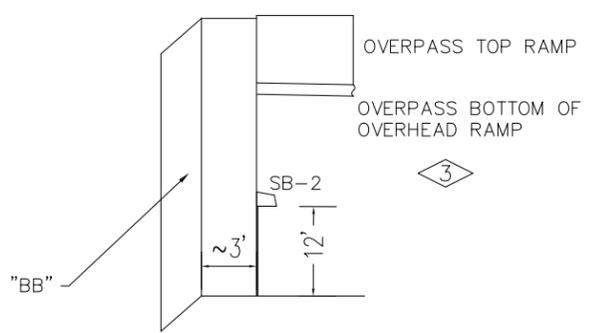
DETAIL "AA" LOOKING NORTH ALONG OVERPASS WALL
